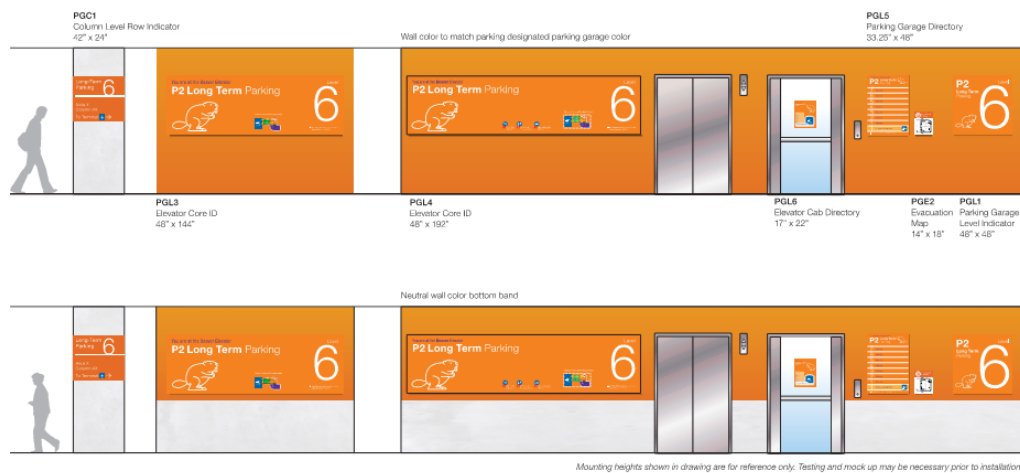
Typical Elevator Core Signage; P2 Garage, Beaver Elevators, Level 6
